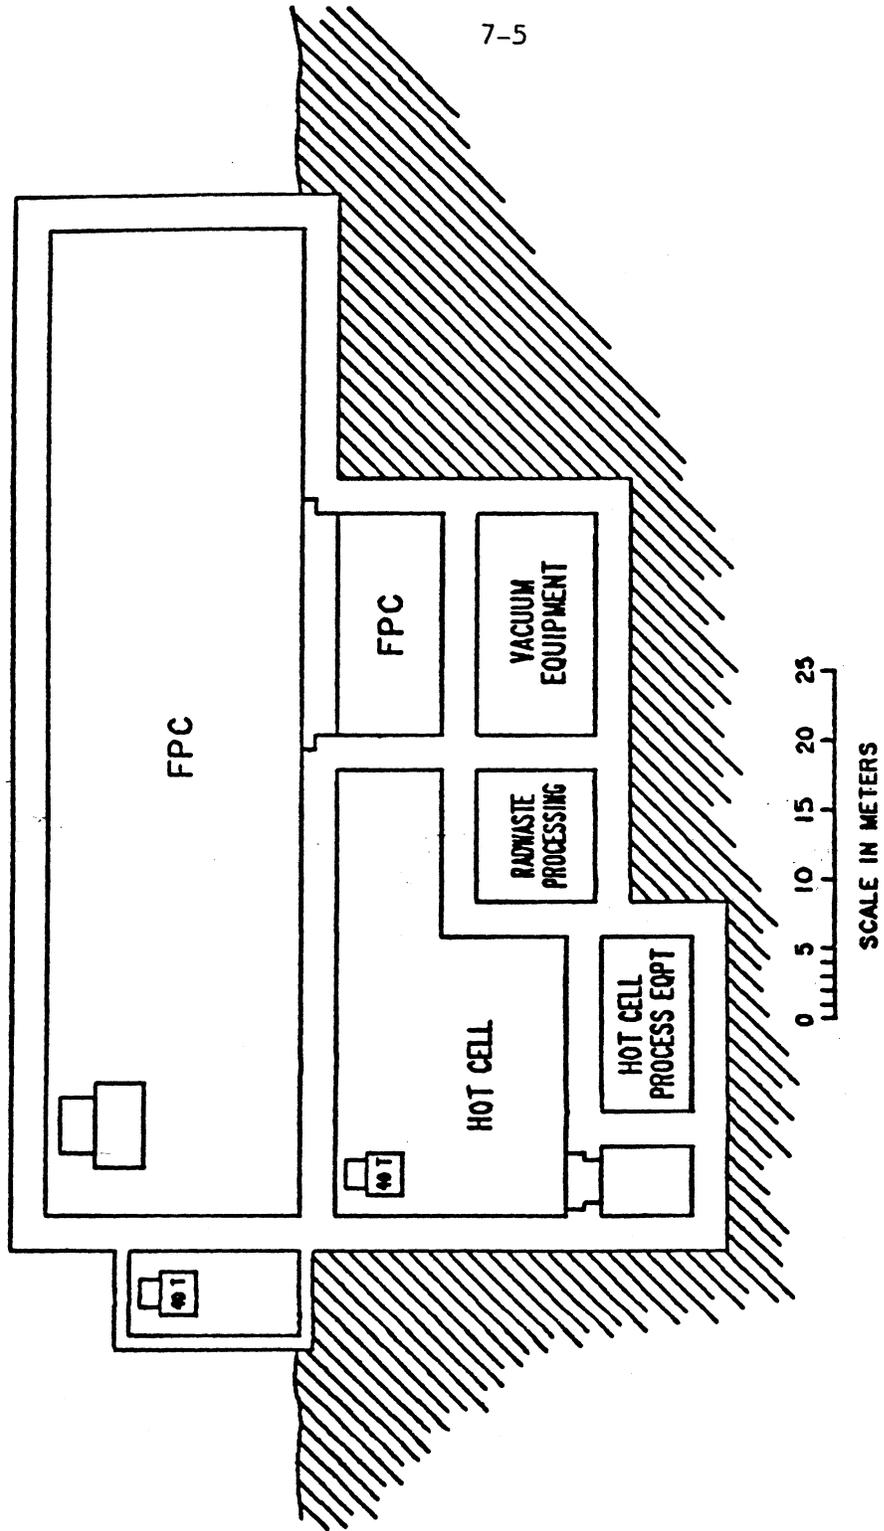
2. TITAN Reactor Building Elevation.
